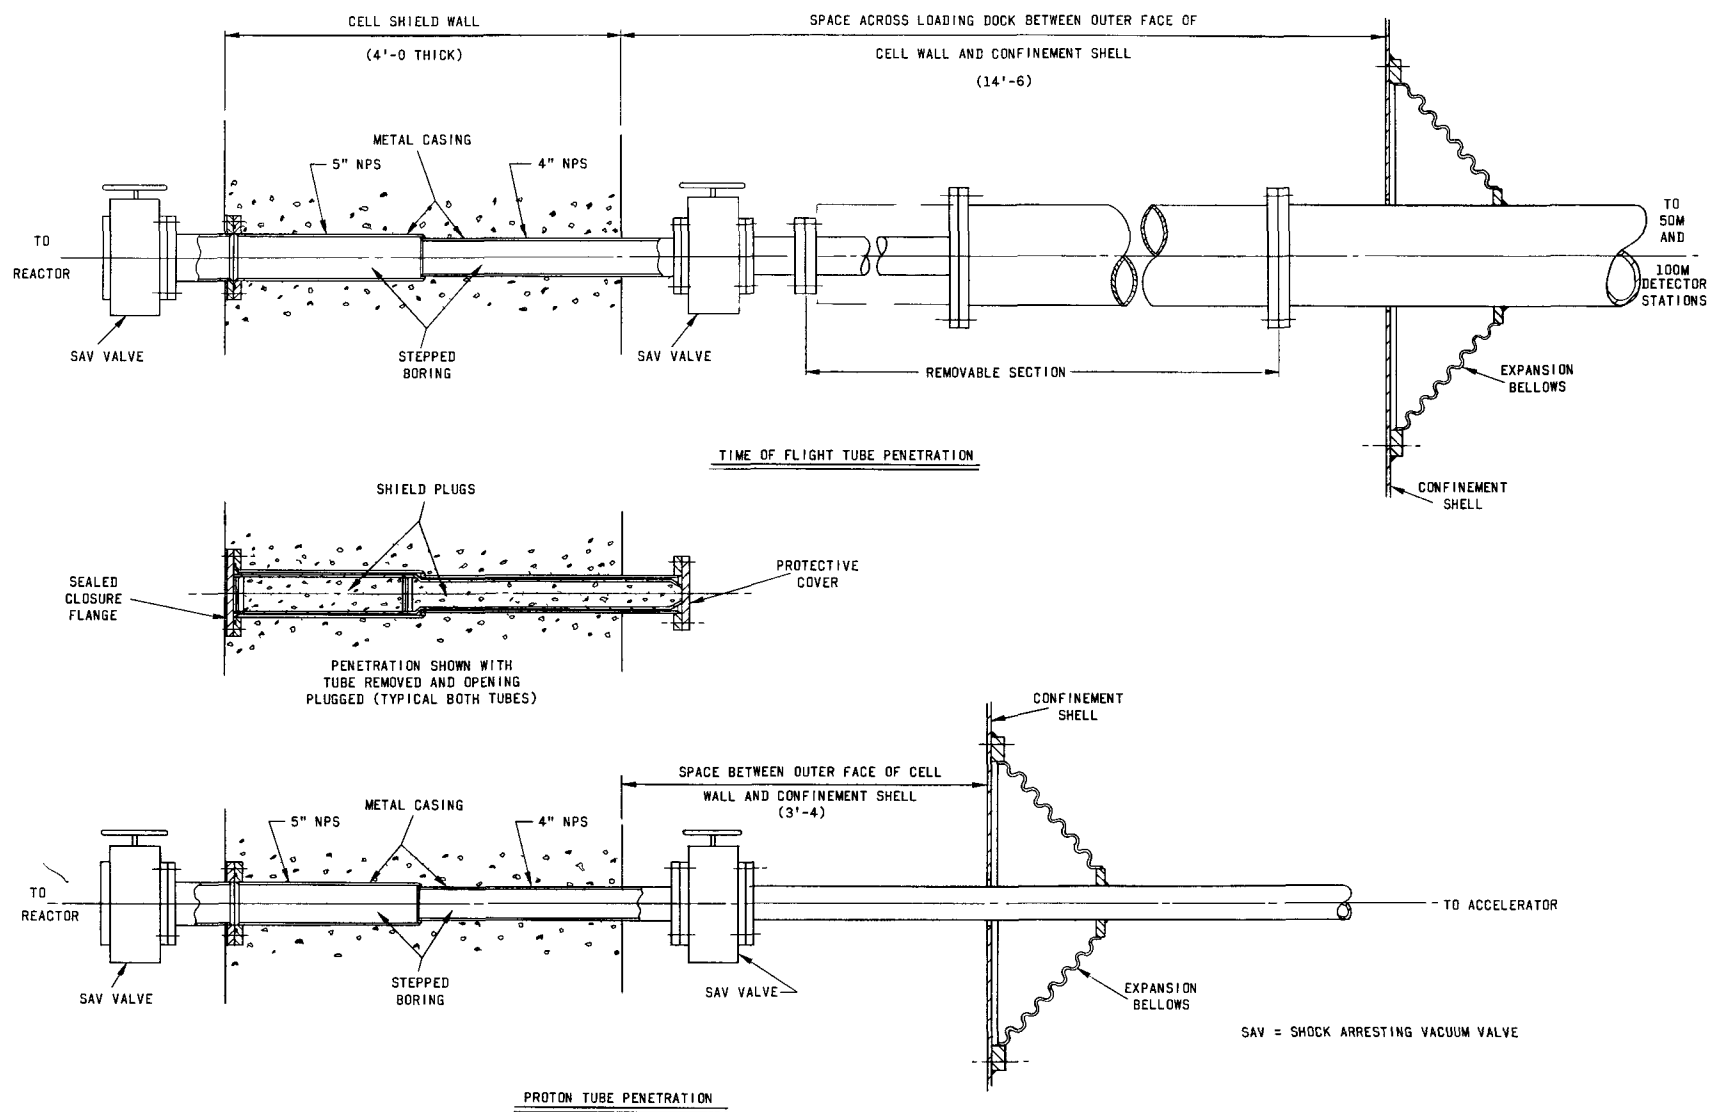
Cell Penetration for TOF Tube and Proton Tube
